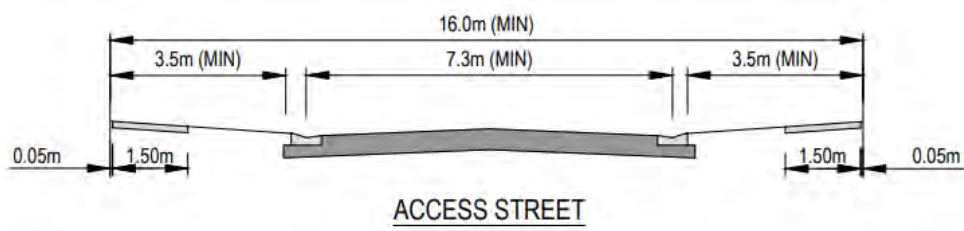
ACCESS STREET CROSS SECTION (IDM)
